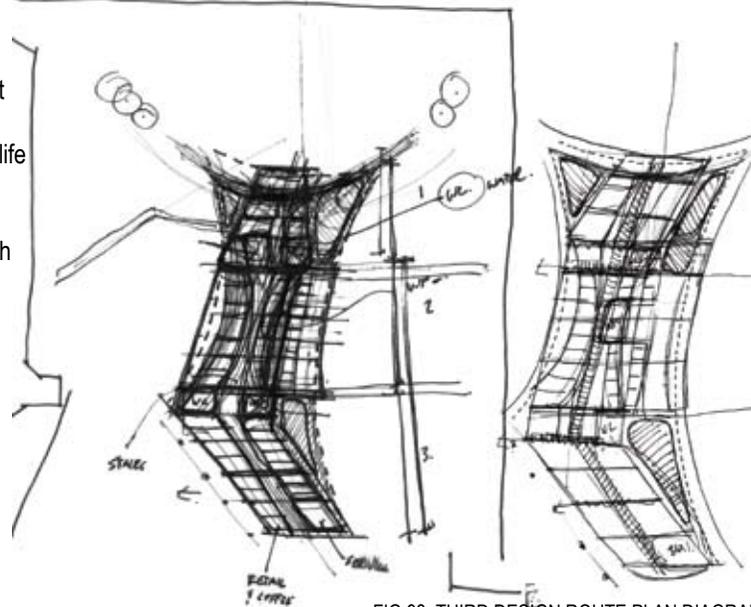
THIRD DESIGN ROUTE PLAN DIAGRAMS
